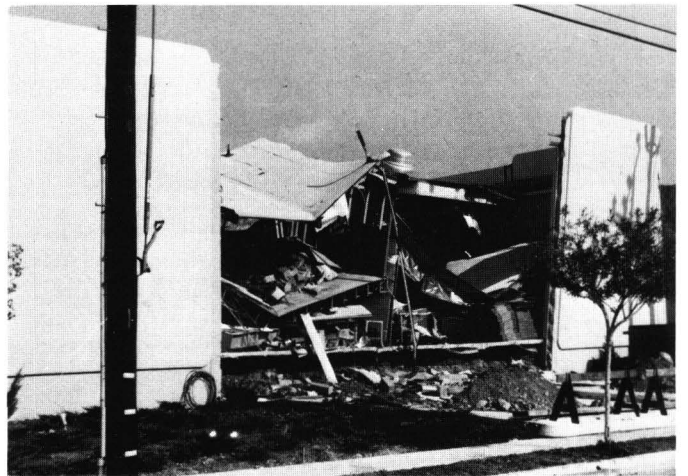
San Fernando Industrial Tract. 12460 Gladstone. Collapsed front wall. J. F. Meehan, OAC photograph.
